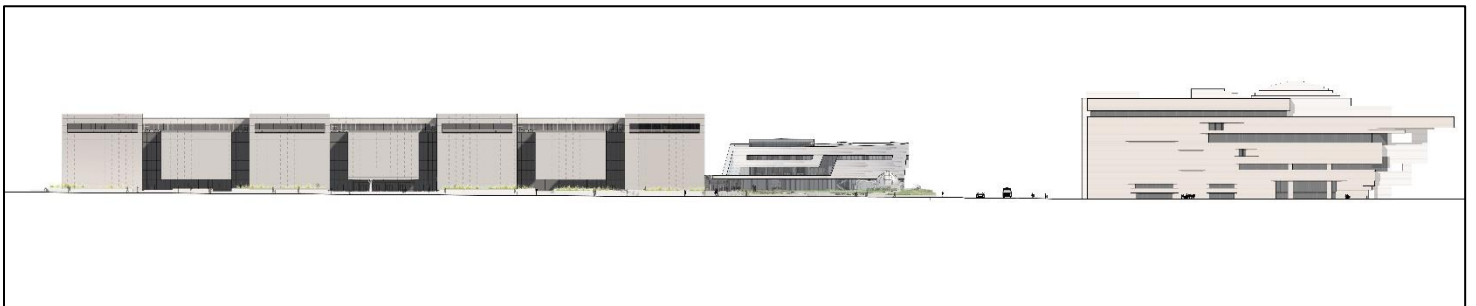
Proposed south elevation of the addition. Note the main mass of the new construction set back, and leaning away from the NASM, to allow the east elevation to remain visible and create a visual separation between the museum and the BLC. (Perkins&Will, 2024)
